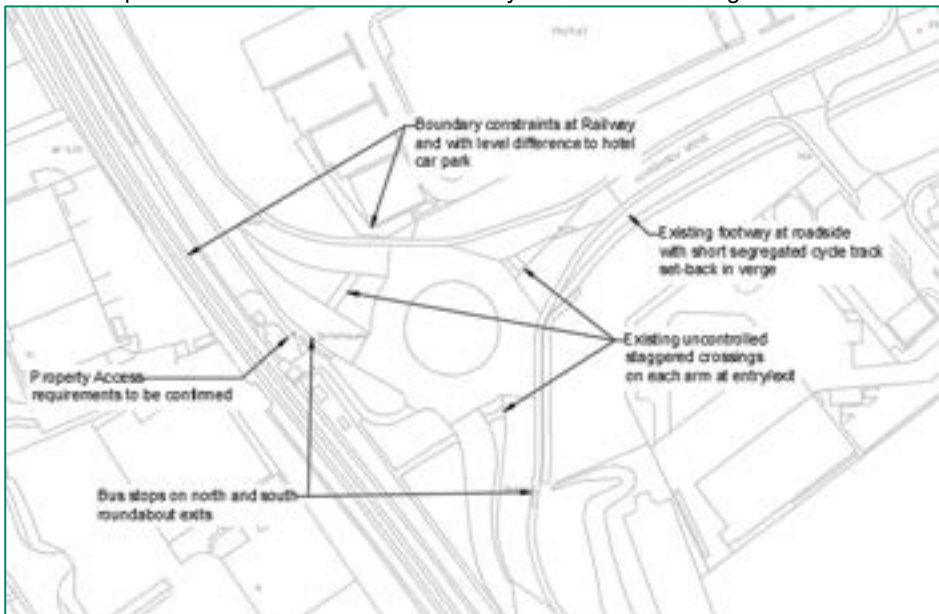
Riverview Drive/Stoneywood Road Roundabout – Existing Layout
